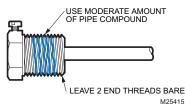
Use good Piping Practice when Installing Immersion Well.
